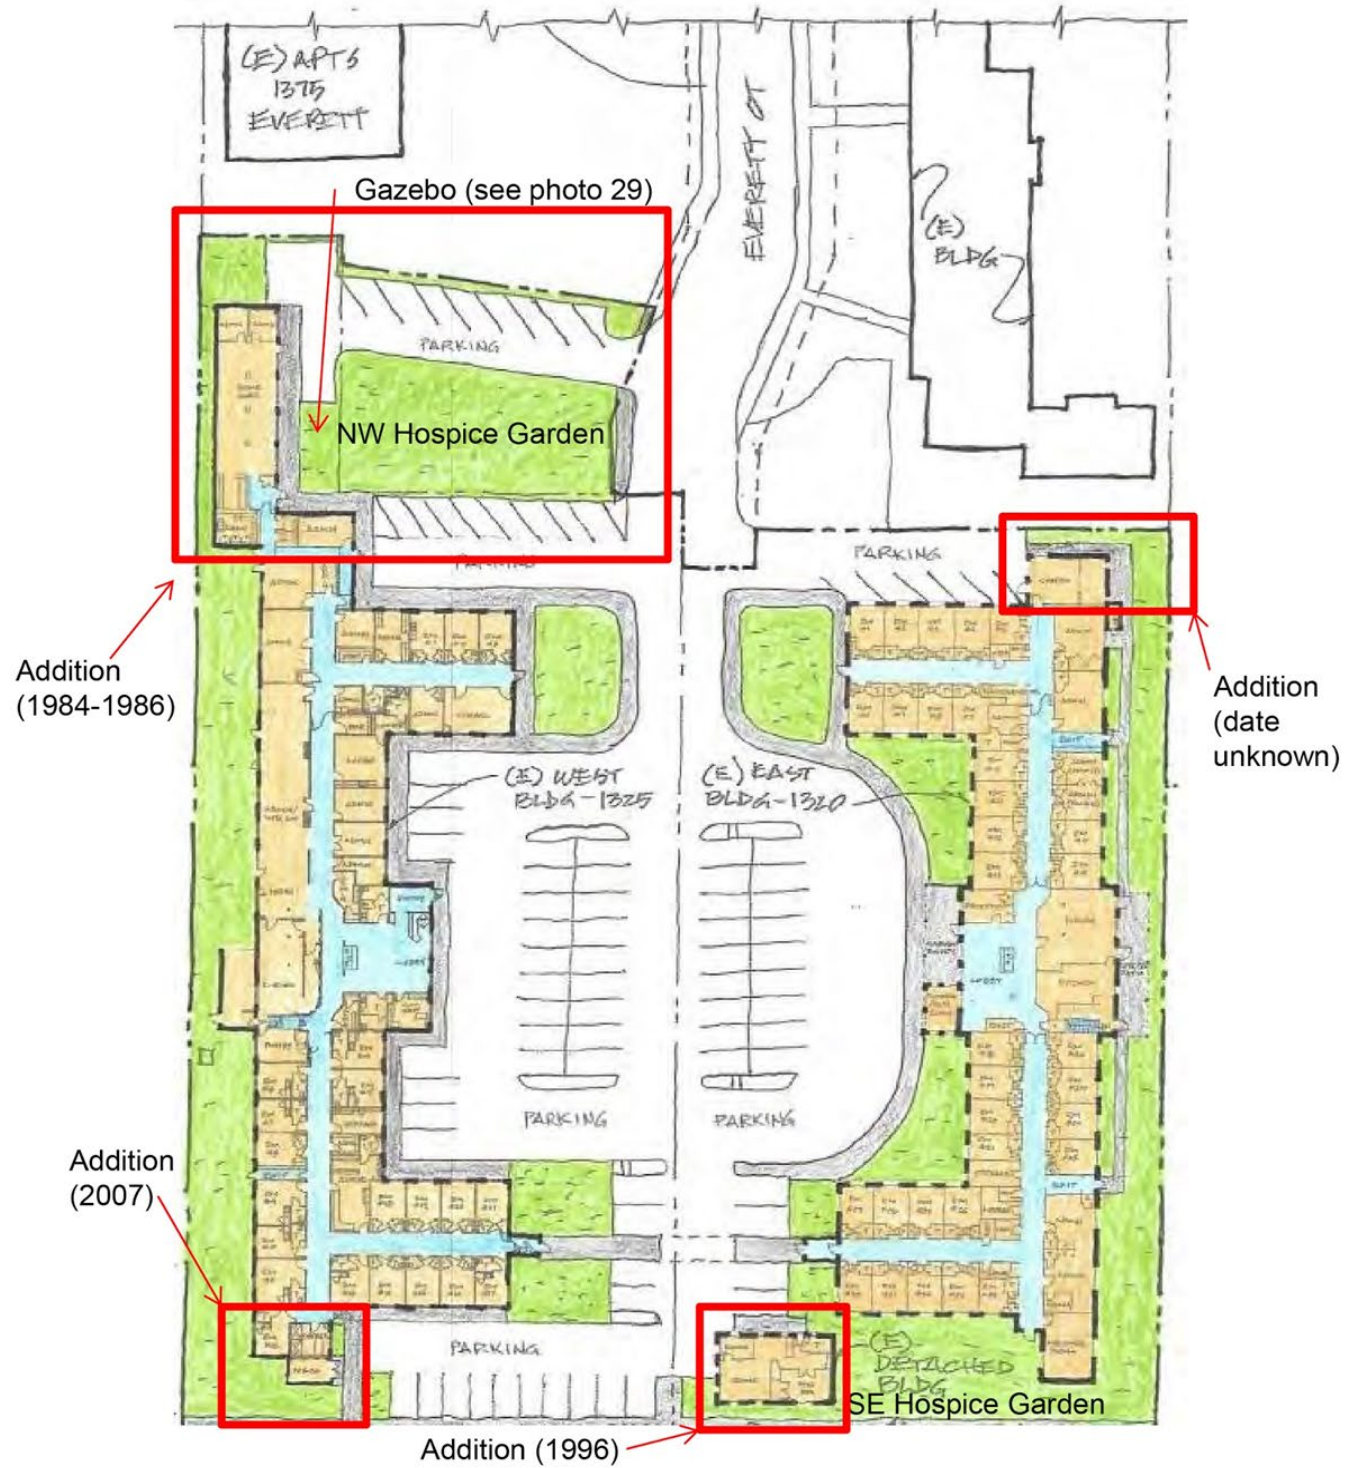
Site and 1<sup>st</sup> Floor Plan, 2015. Source: Hartman Ely Investments (HEI)
